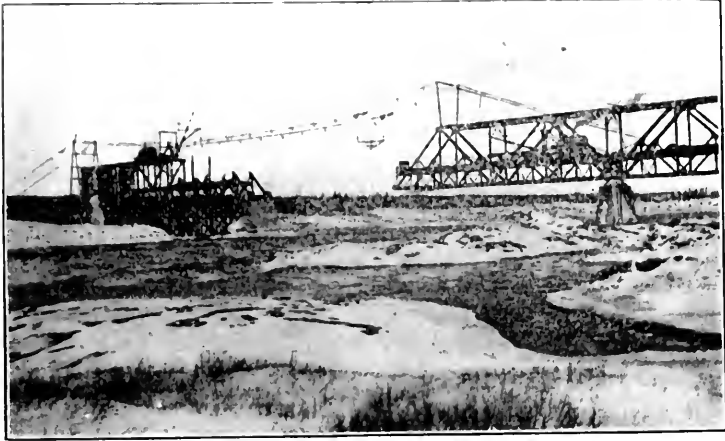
View shewing cableway with its equalizing-girder; derriek-car on southern cantilever; traveller on top-chords of northern anchor-span.
